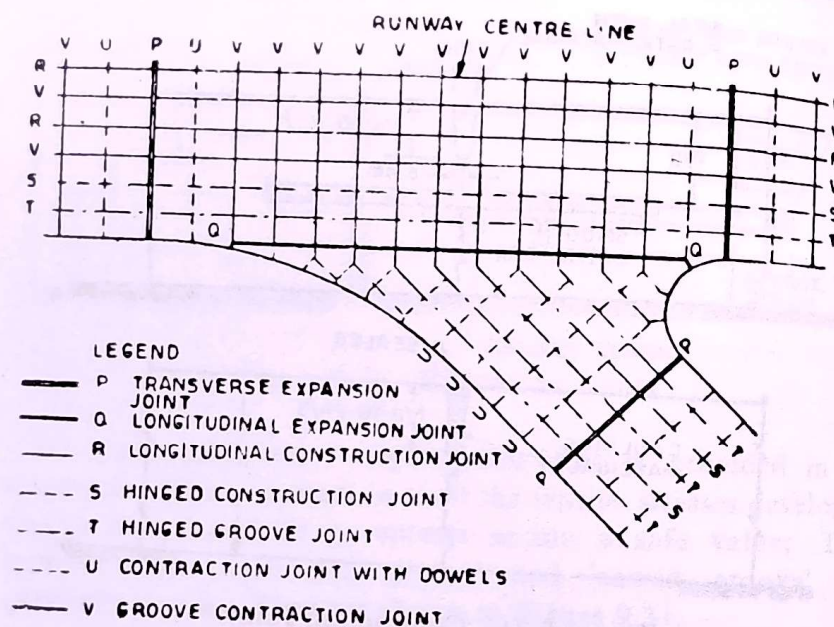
Layout of Joints at Intersection Between Runway and Taxiway
